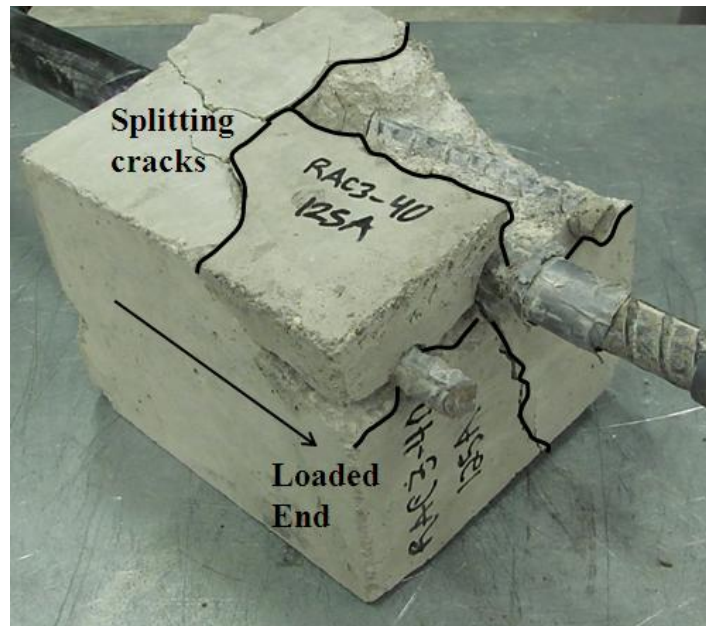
Main anchorage zone and splitting crack pattern (dissected BE-RAC3-40-125A)
